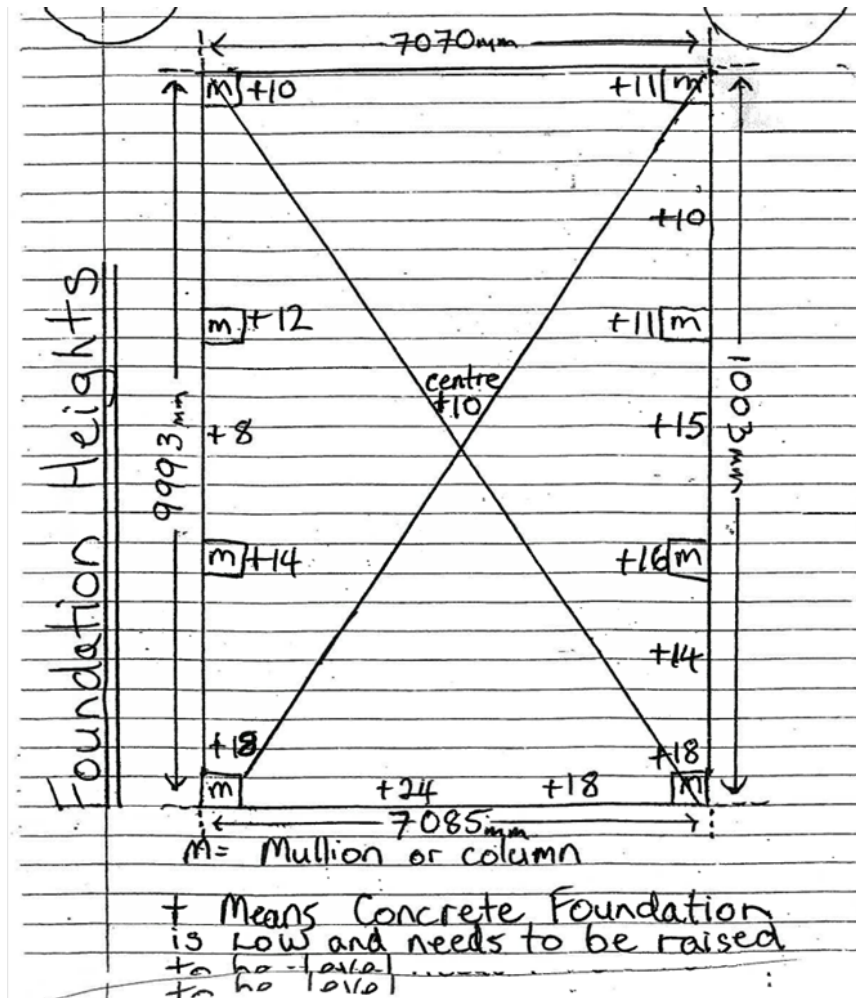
Diagram of variations in the concrete slab foundation (not to scale)
